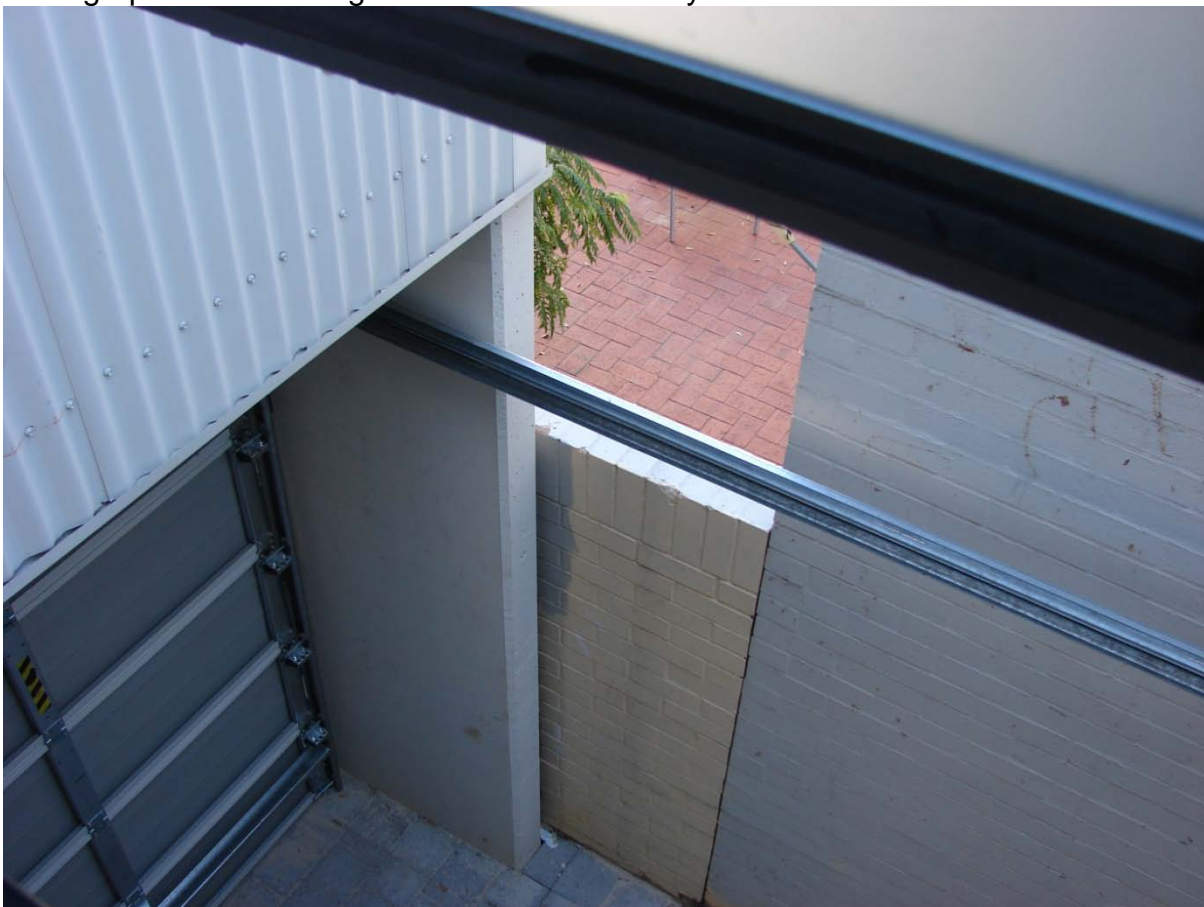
taken in passageway looking towards 86 Marine terrace – refer to Item No. F2 of report
